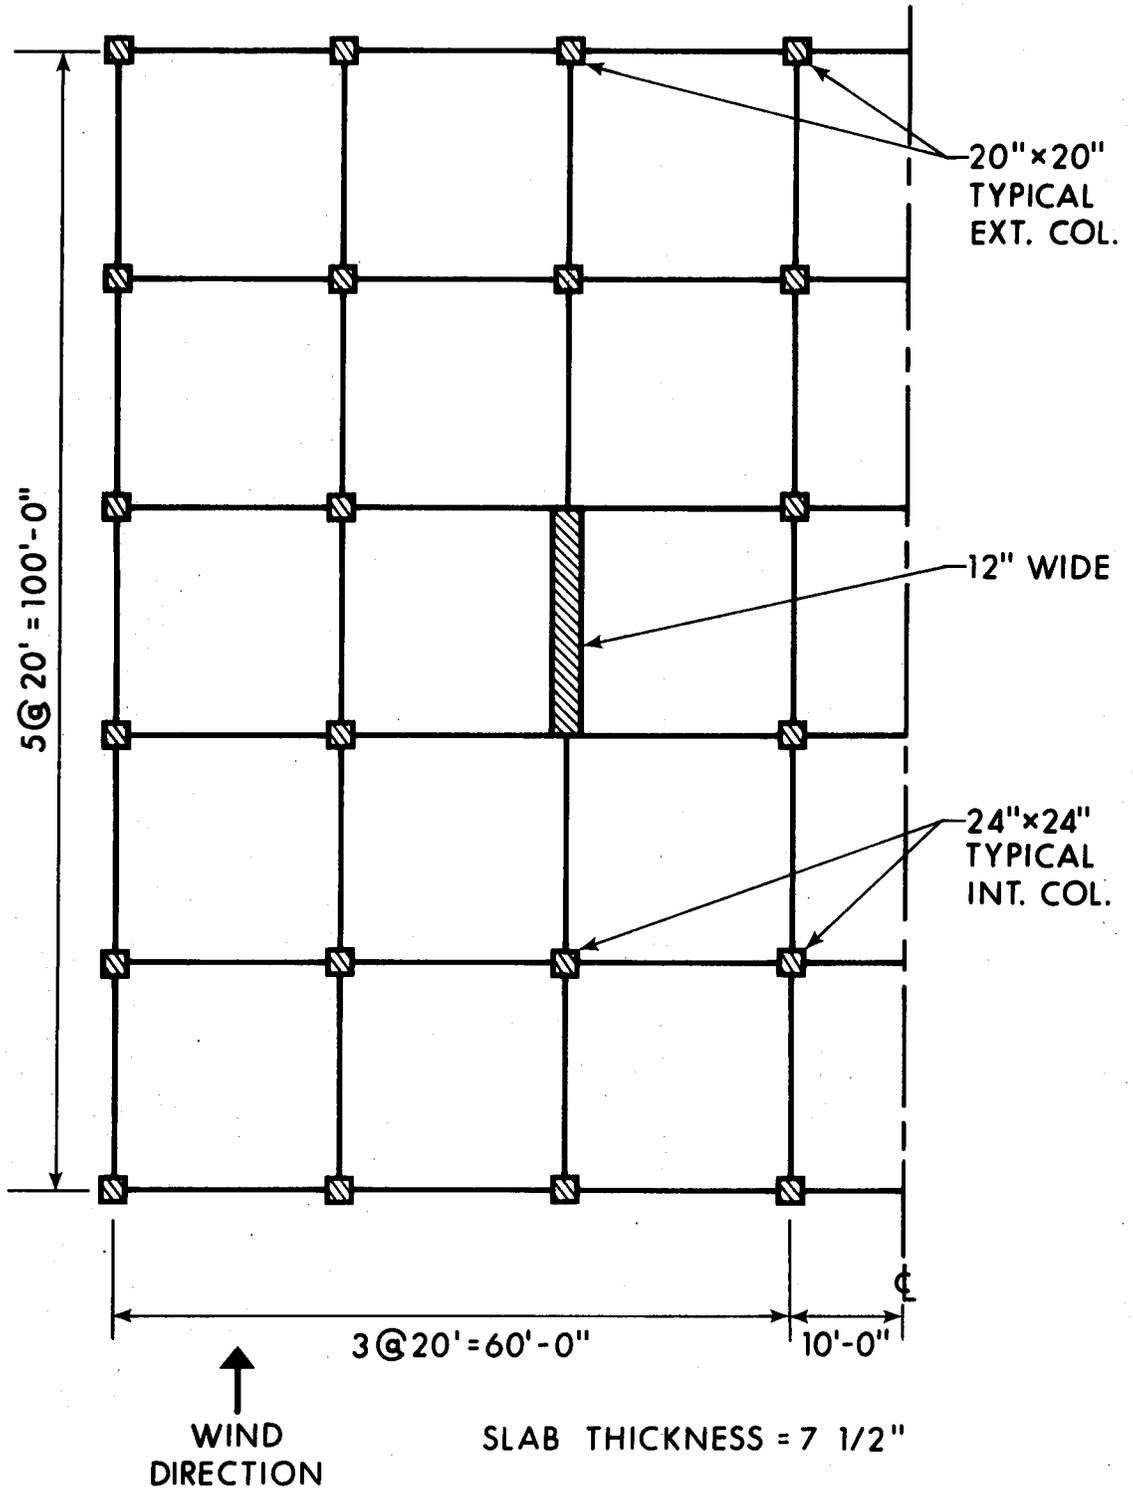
PLAN OF FRAME TYPE SIX
